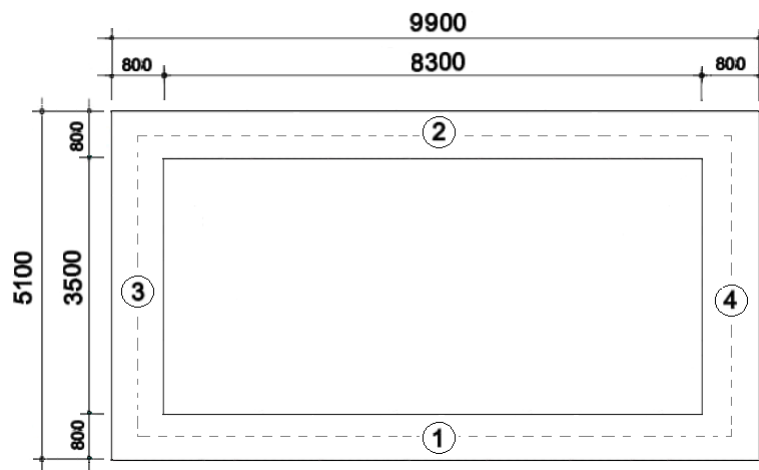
Foundation plan of the shallow concrete strip foundation
